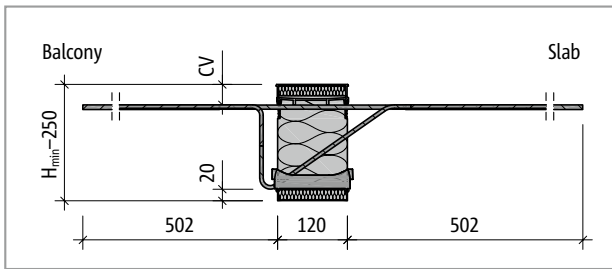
Schöck Isokorb® XT type K-M1 to M4: Product section
